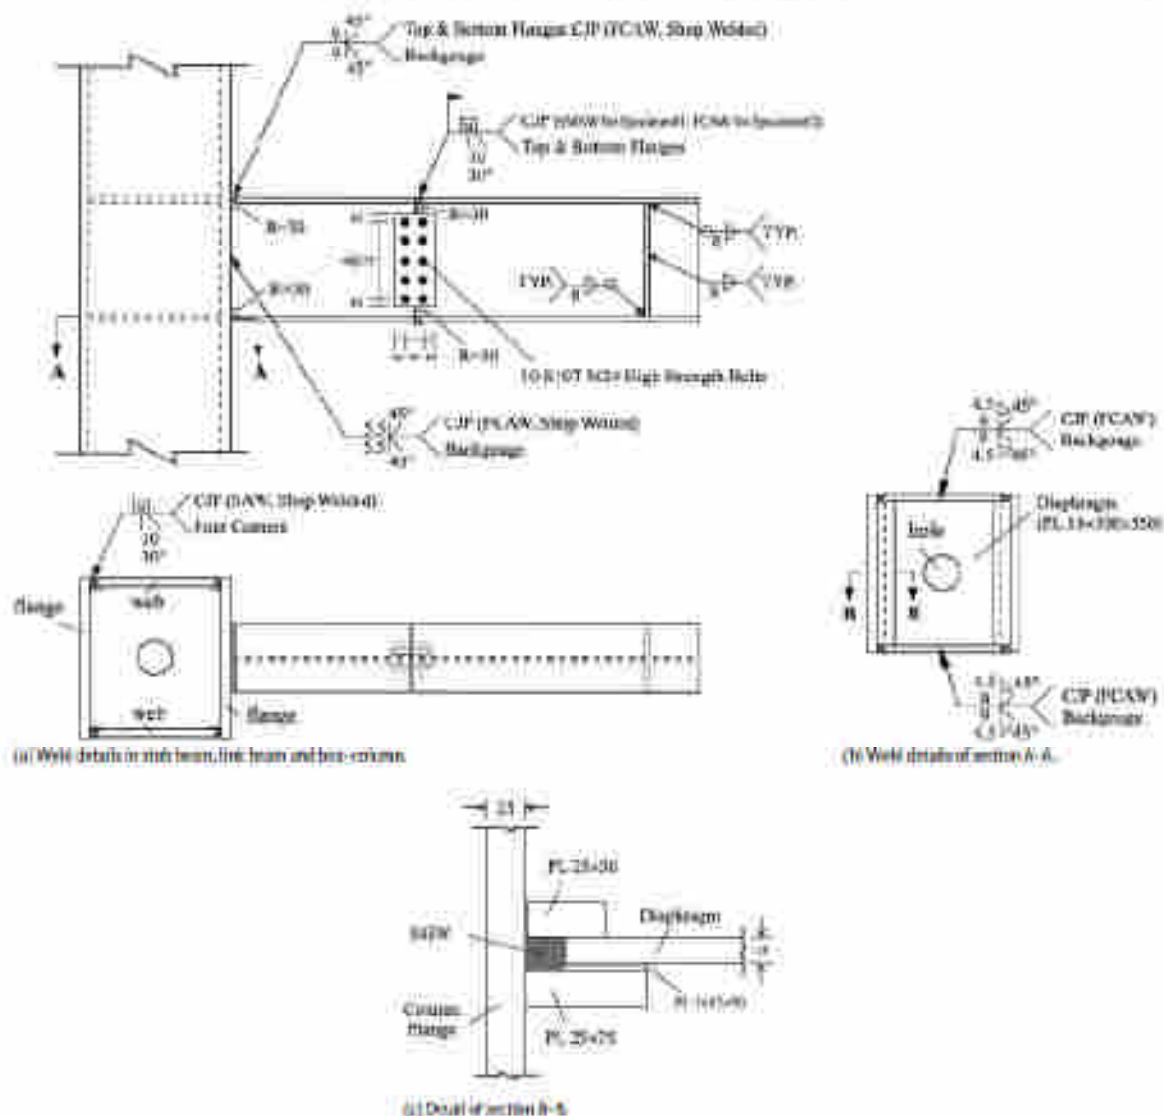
Weld details in steel moment-resisting frames (units: mm).
